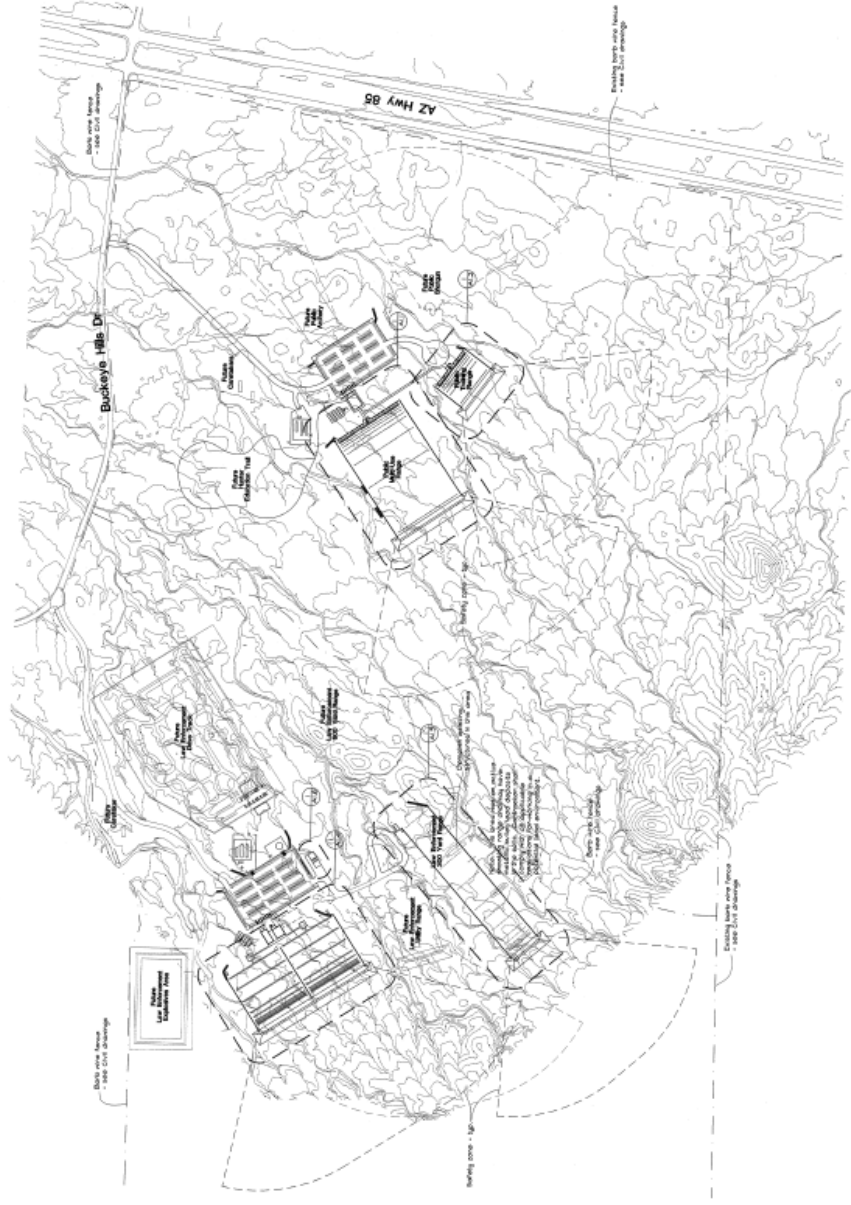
EXHIBIT A BUCKEYE HILLS SHOOTING PARK PLAN (Not to Scale)
